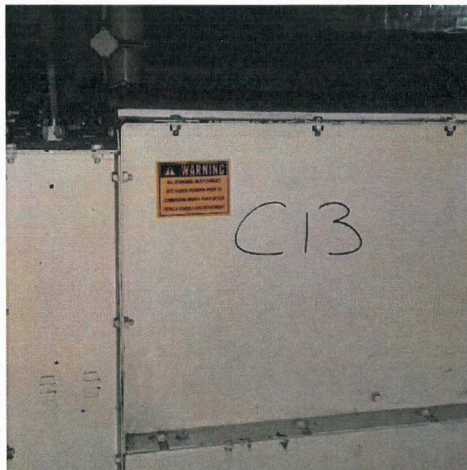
Level 23, Plant Room, West Perimeter Air Handler Unit - Mastic
